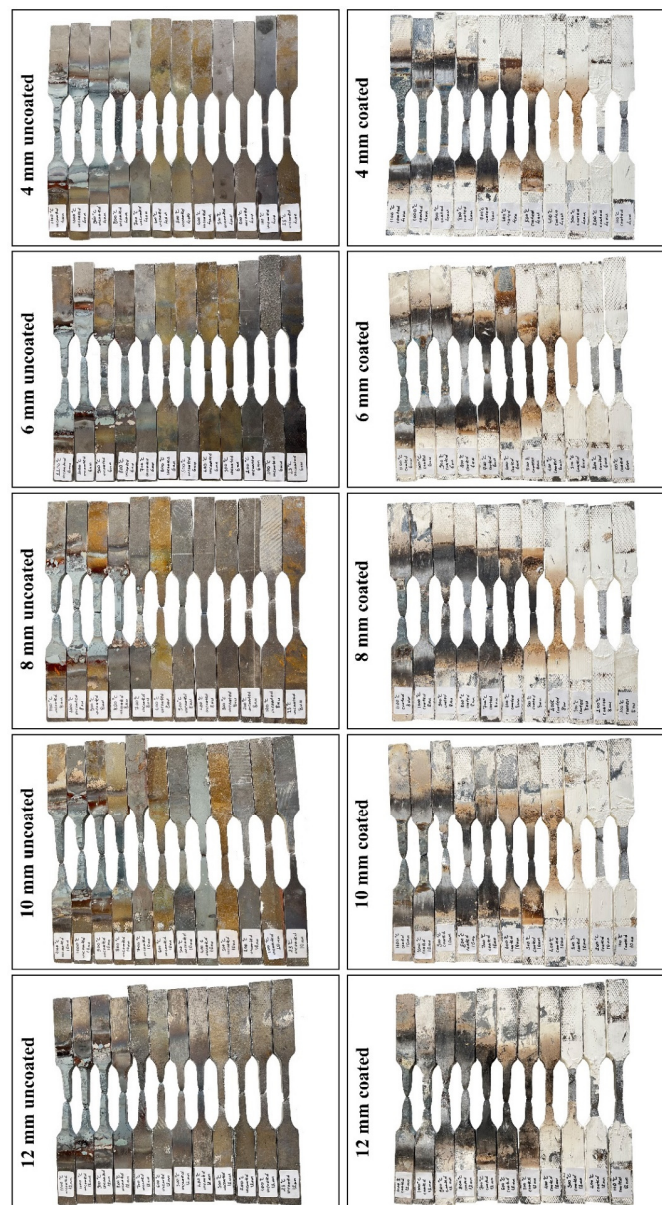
Fracture surfaces of the test specimens after exposure to fire.
